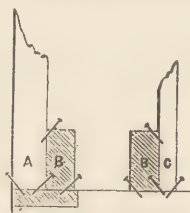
ELEVATION SECTION—manner of nailing.—A. corner stud, 4 by 4—B. joist, 5 by 3—C. 2 by 4.
